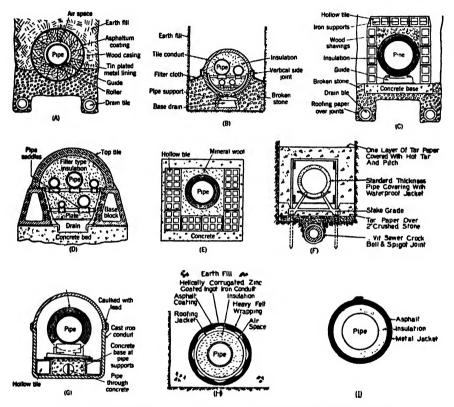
CONSTRUCTION DETAILS OF CONDUITS COMMONLY USED
